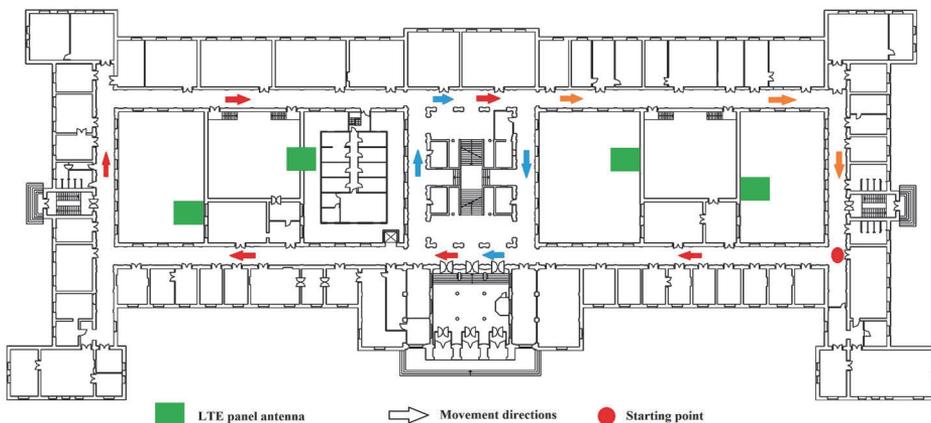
Ground floor scheme of the School of Electrical Engineering with LTE technology base stations antenna layout.
